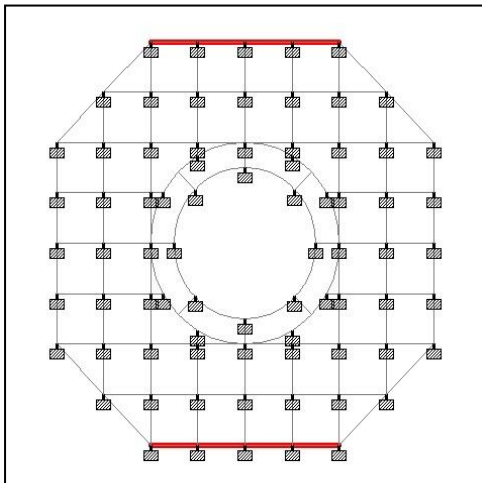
(c). Model 3- Building with shear wall on opposite sides in X-direction
